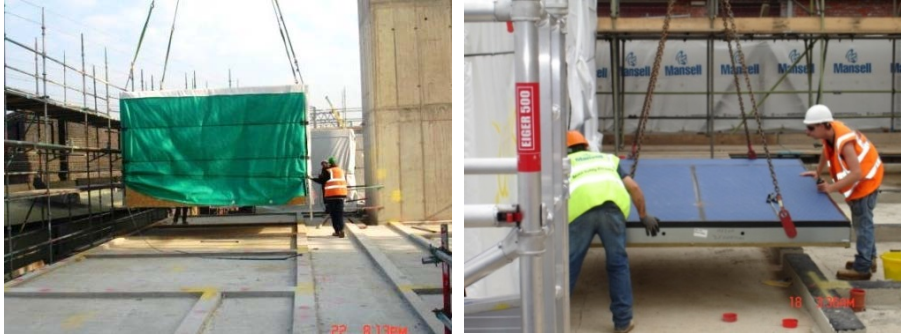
(left): Site photo: Module suspended by crane & guided into place on foundations [REDACTED] 2012]
